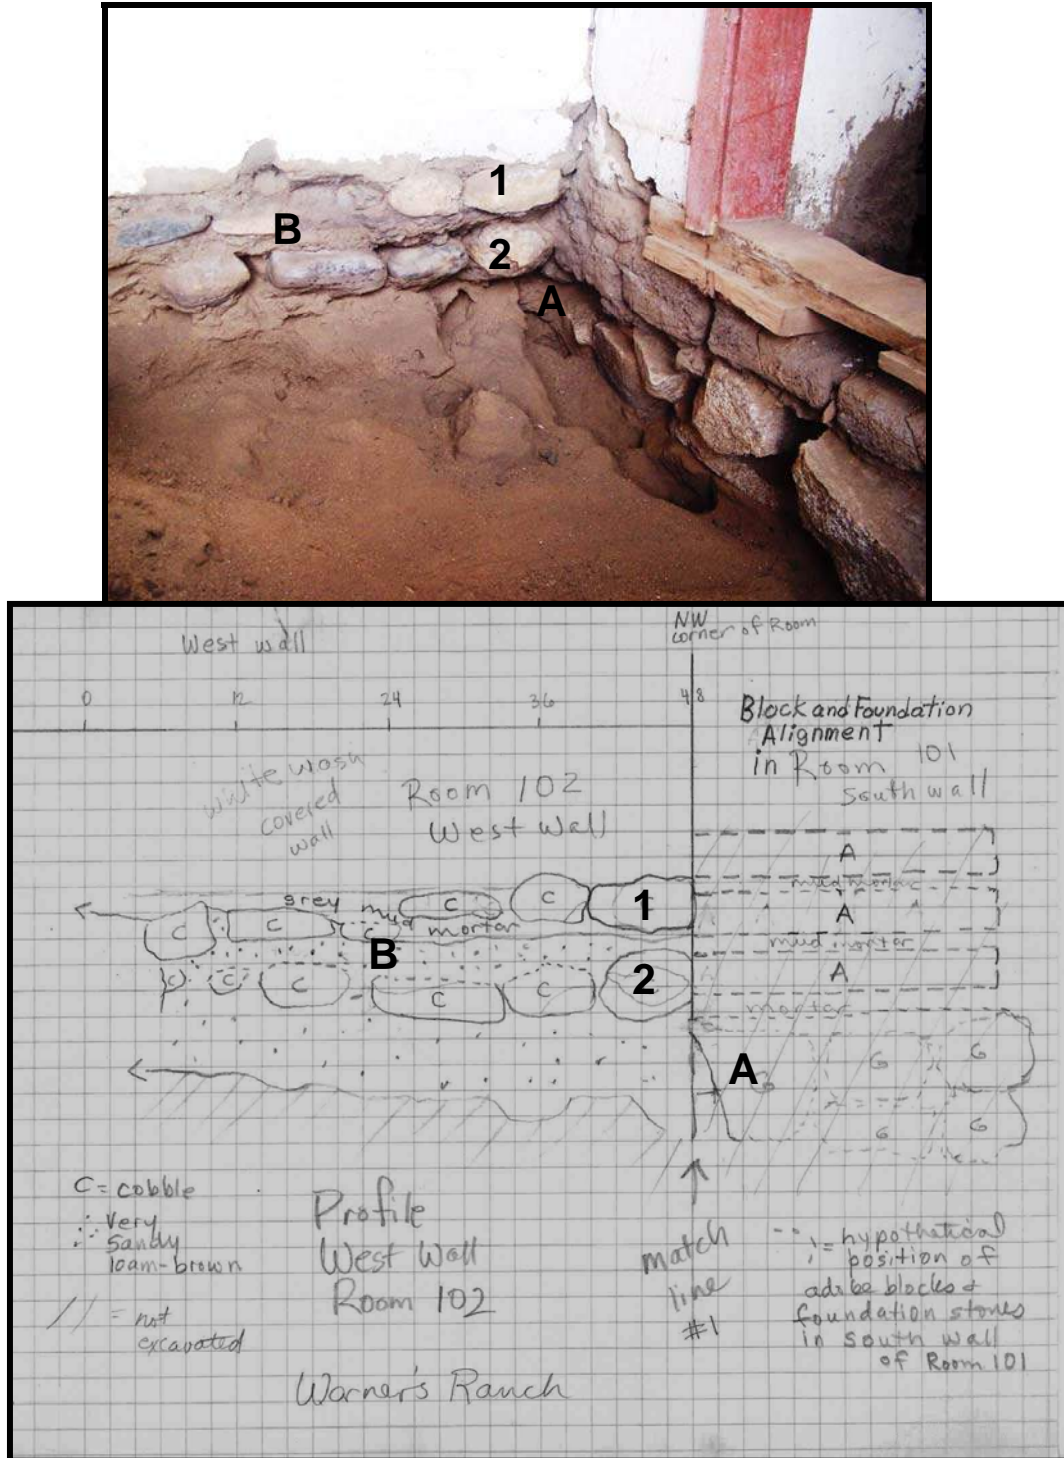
Photograph and profile of the east wall foundation of Room 103, as seen in the west wall of Unit 10-2, Room 102, showing the relationship between the angular granite field stone footing of the Central Wing (A) and the higher placed, multi-course foundation of the interior dividing wall(B). Points 1 and 2 represent the same cobbles in the photo and profile.
